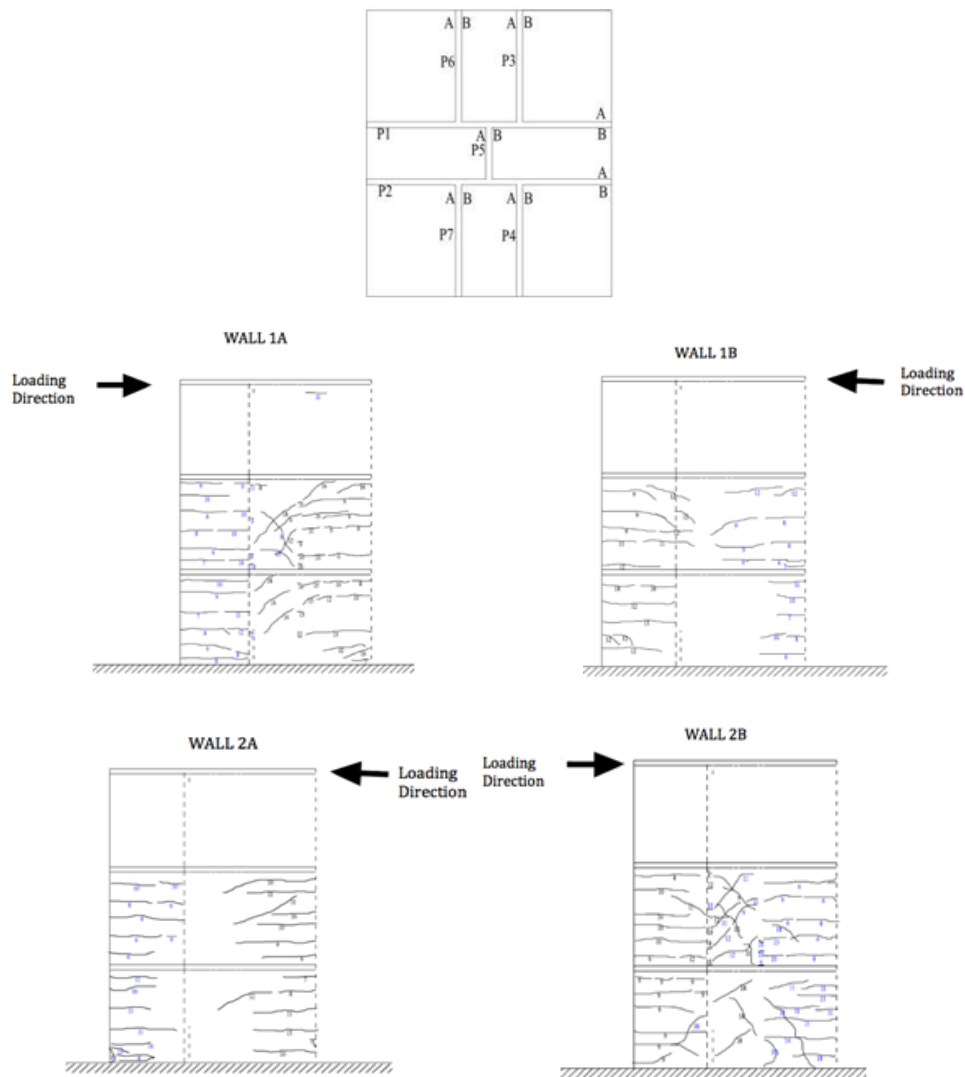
Wall numbering and crack propagations corresponding to loading steps (step numbers are indicated on the cracks).
